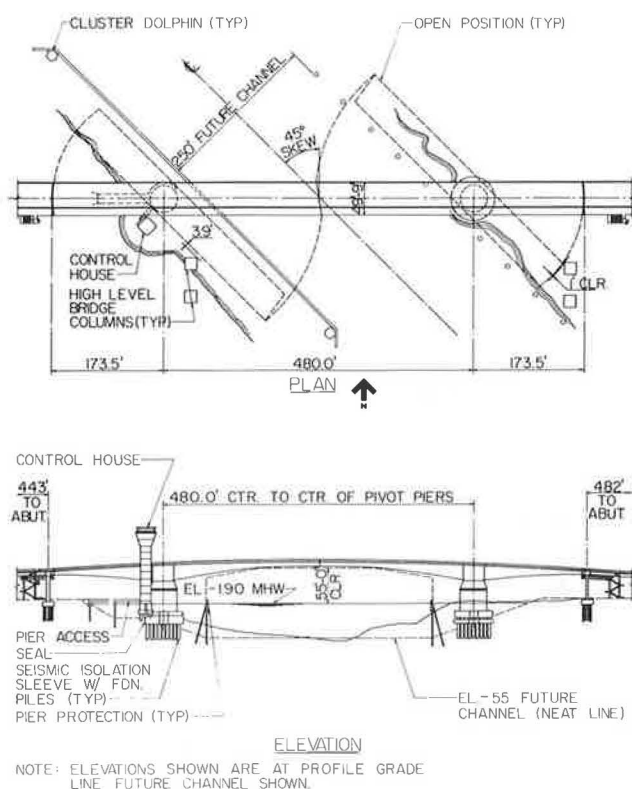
West Seattle Swing Bridge: plan and elevation.
